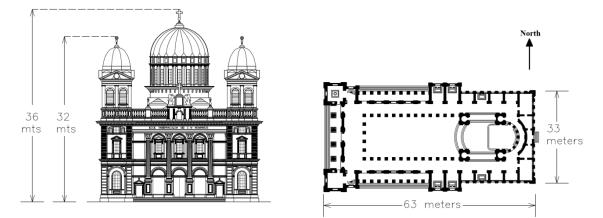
Basilica of the Blessed Sacramento: West elevation (left); plan (right).
